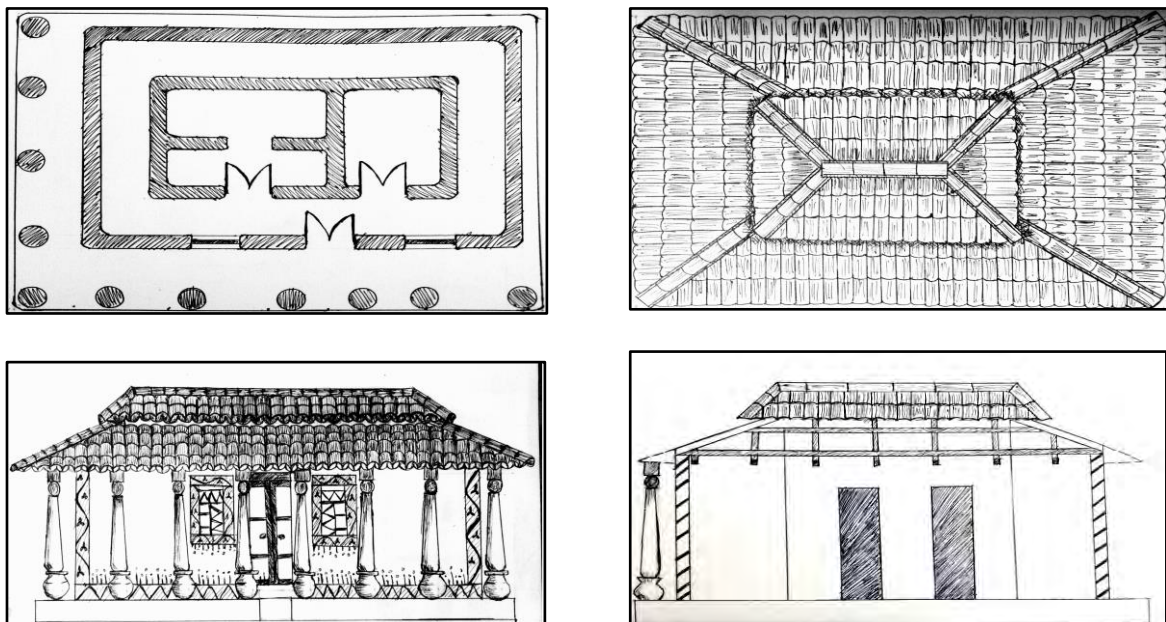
Rajwar dwelling IGRMS, Bhopal Ground Plan, Roof Plan, Elevation and Section Source Kirpa John
